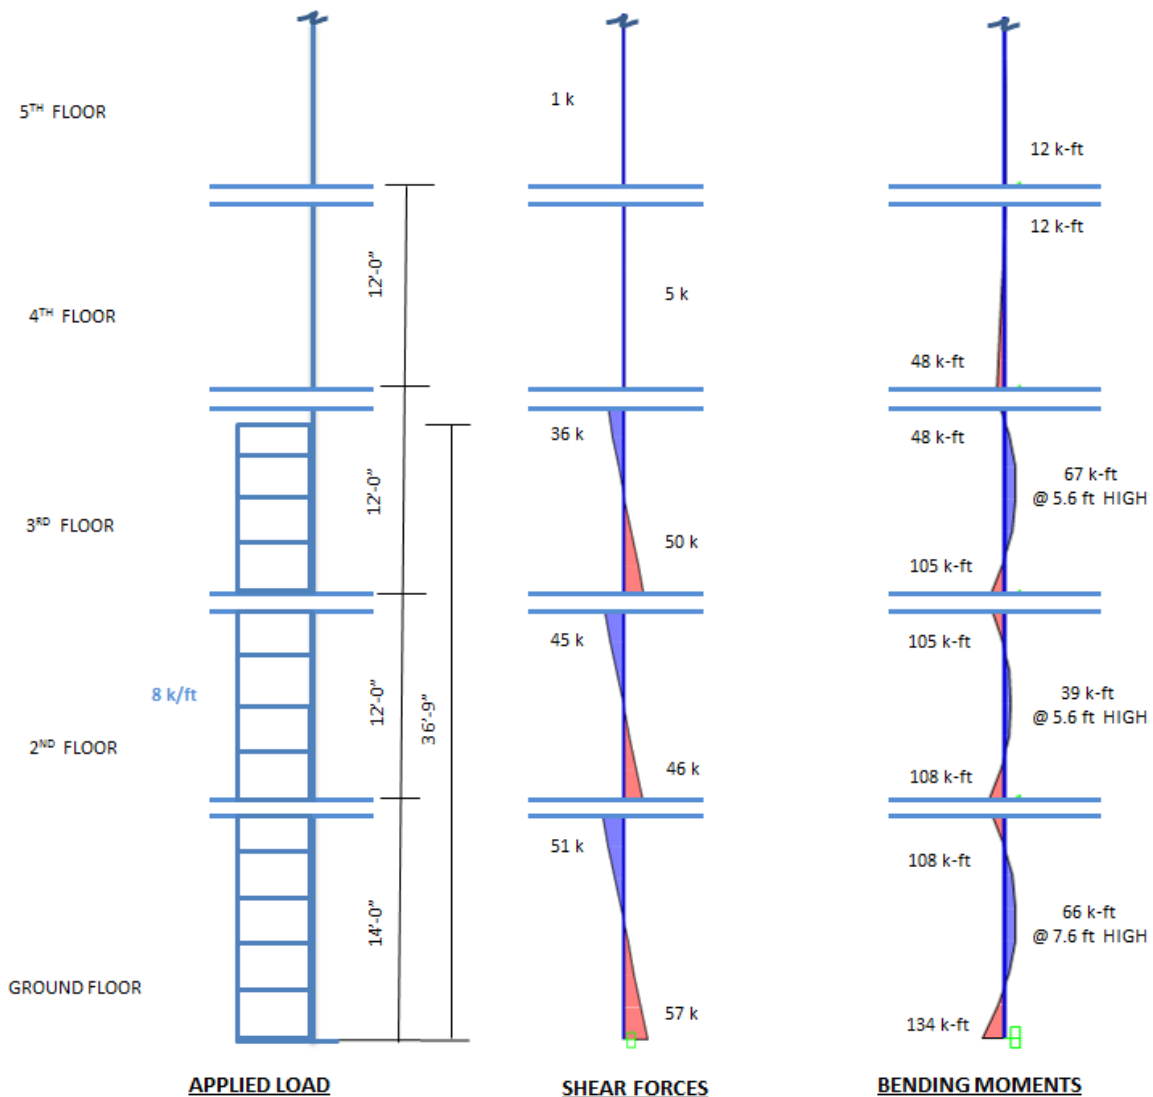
Hydrodynamic loading on interior column of Hilo office building due to Load Case 2
